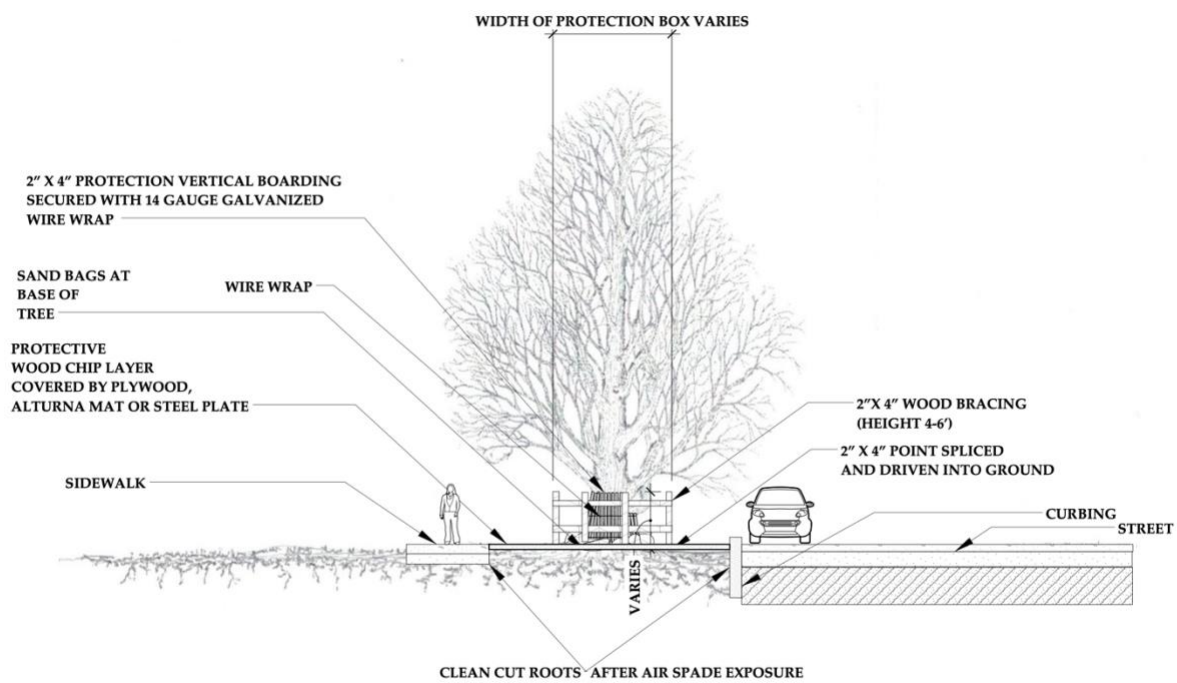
Trees, Sidewalks and Streets - TPZ Varies (Not to Scale)
